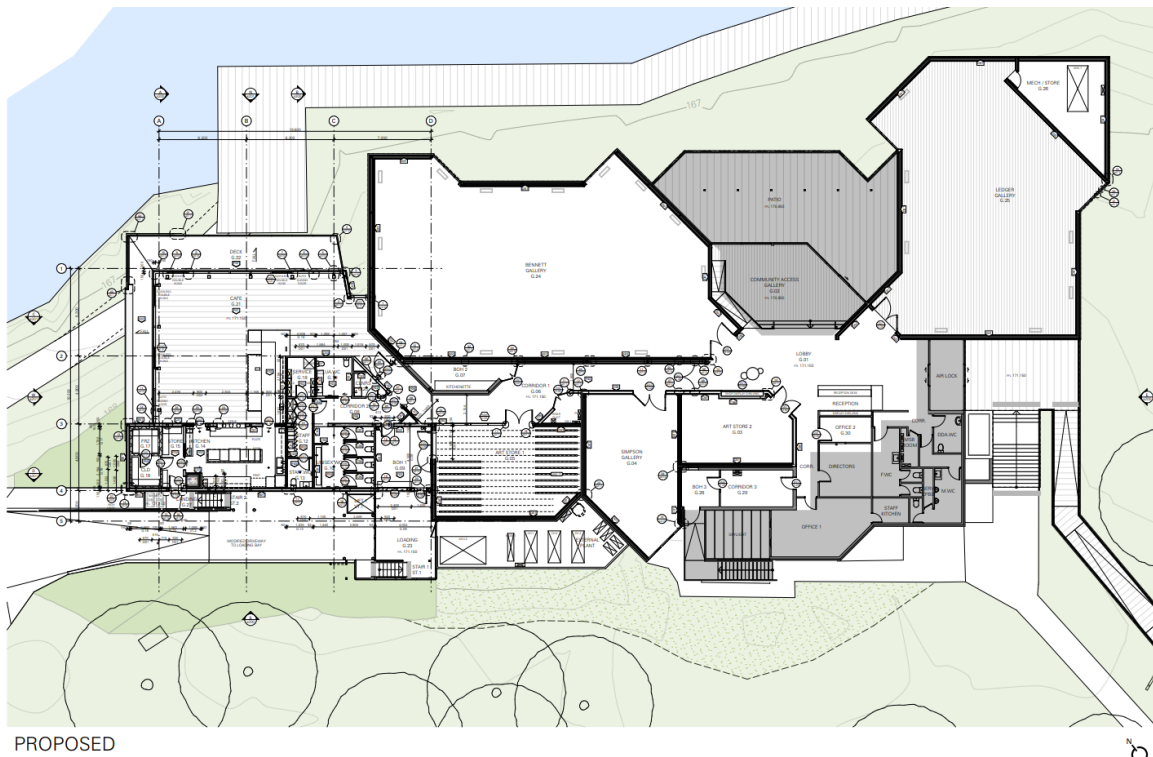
Proposed ground floor plan, including addition to the north-west and internal alterations. Hatched in grey is not affected by the proposed works. Source: WBa, April 2025.
